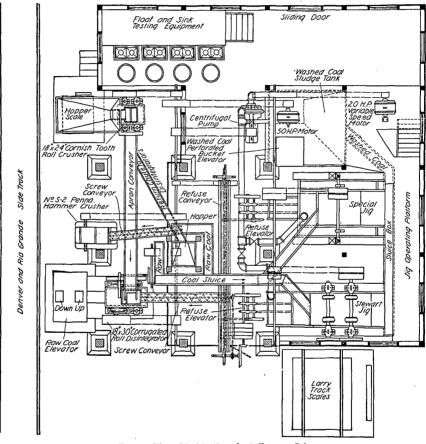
Plan of fuel-testing plant, Denver, Colo.
